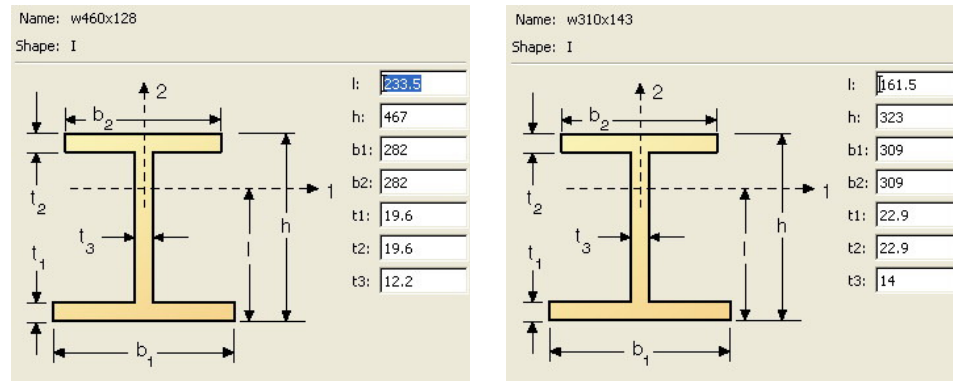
Dimensions of the beams (a) and columns (b) cross-section
